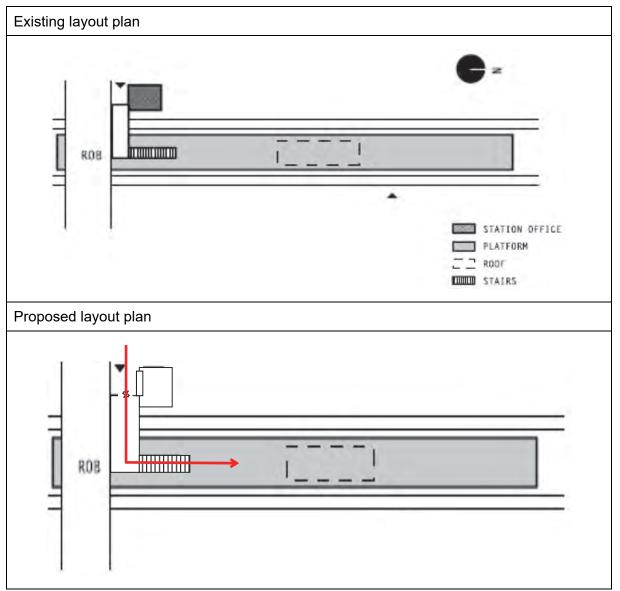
Existing and Proposed Layout Plan (Ahlone Road Station)
